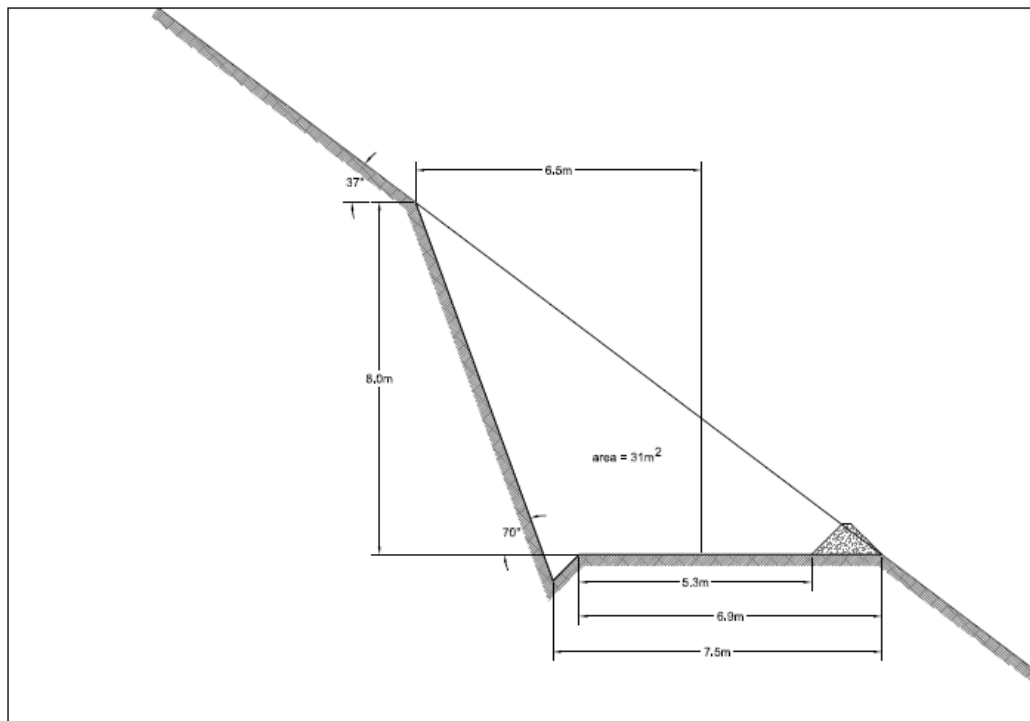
Typical Cross-section showing Full Bench Cut. Cut Slope 70°
